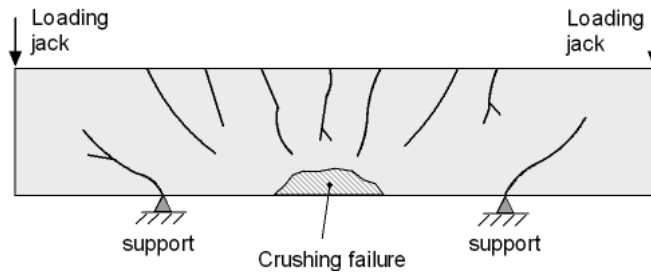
Typical crack pattern in a concrete beam
